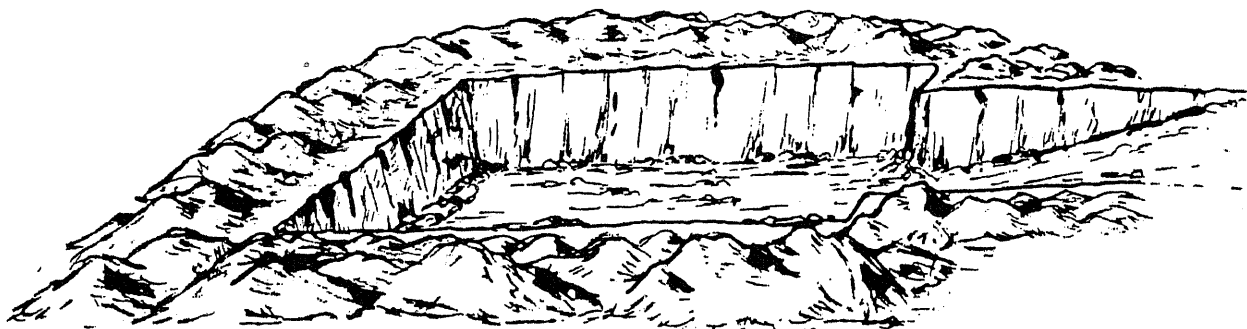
Plan of emplacement constructed with a scoop loader.
